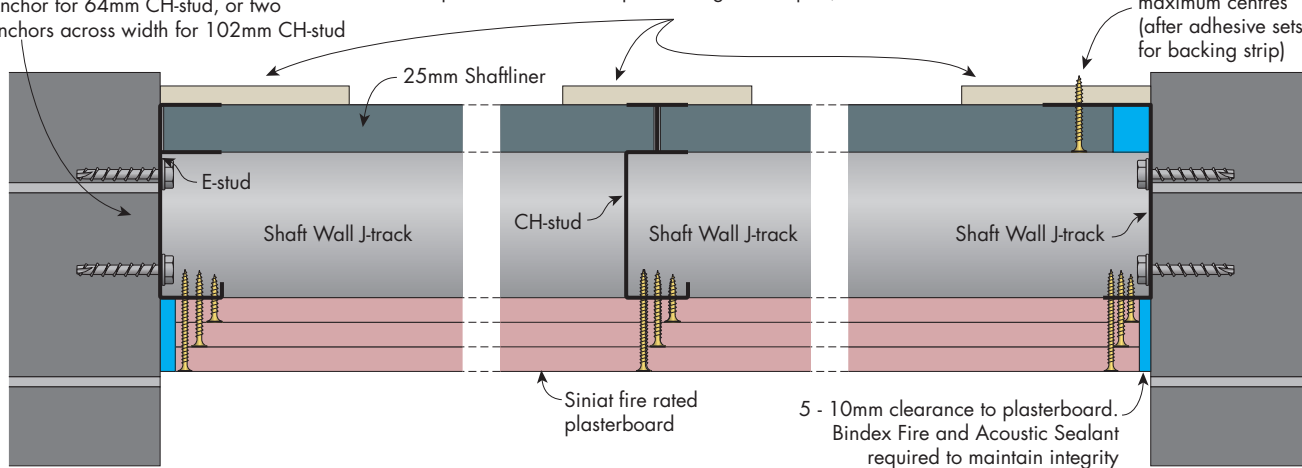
Stud Bulkhead Using Shaft Wall Ceiling
